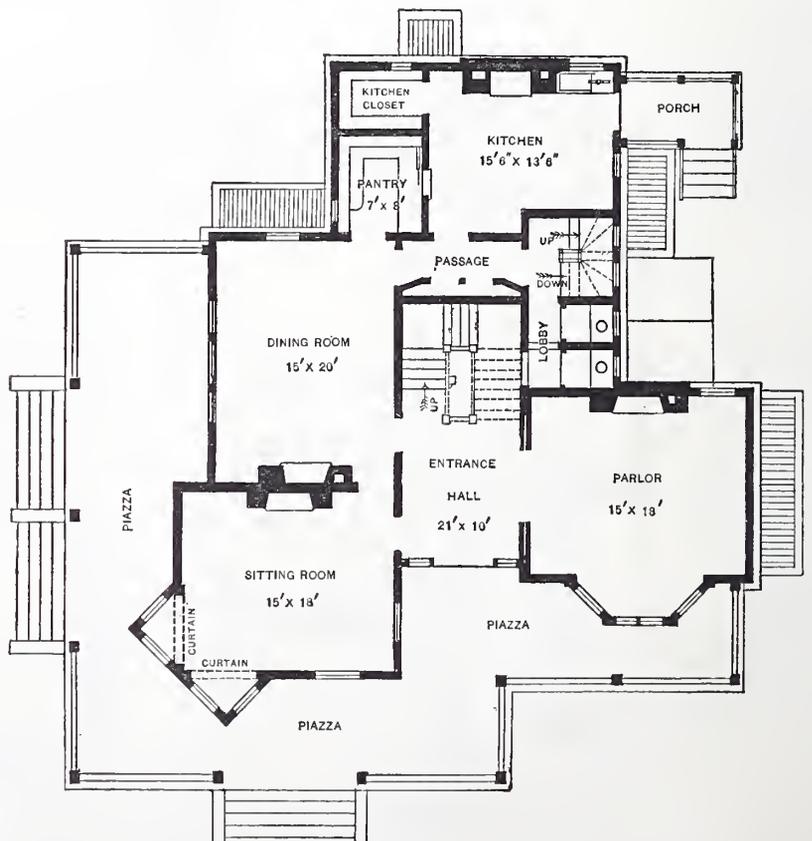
First Floor Plan by "T-Square."—Scale, 1-16 Inch to the Foot.
